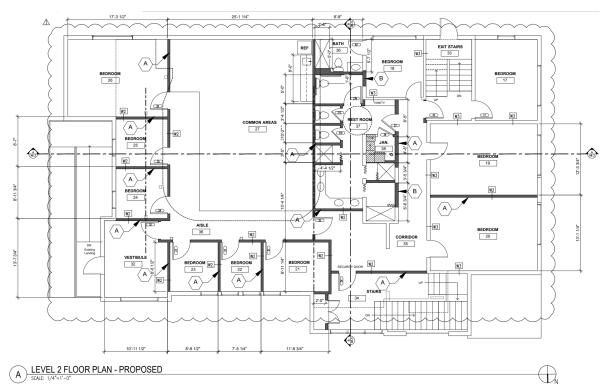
Level 2 flood plan for church conversion in Port Orchard. Note: this floor plan would not meet the co-living model code provisions requiring a shared kitchen on every floor sleeping units under 300 sf.
